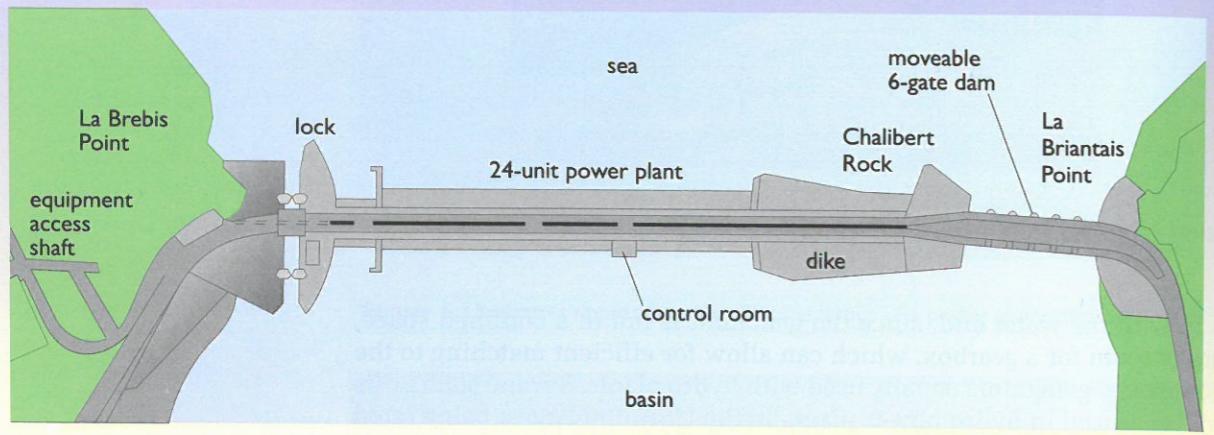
Layout of the Rance Barrage (source: Department of Energy, 1981)
